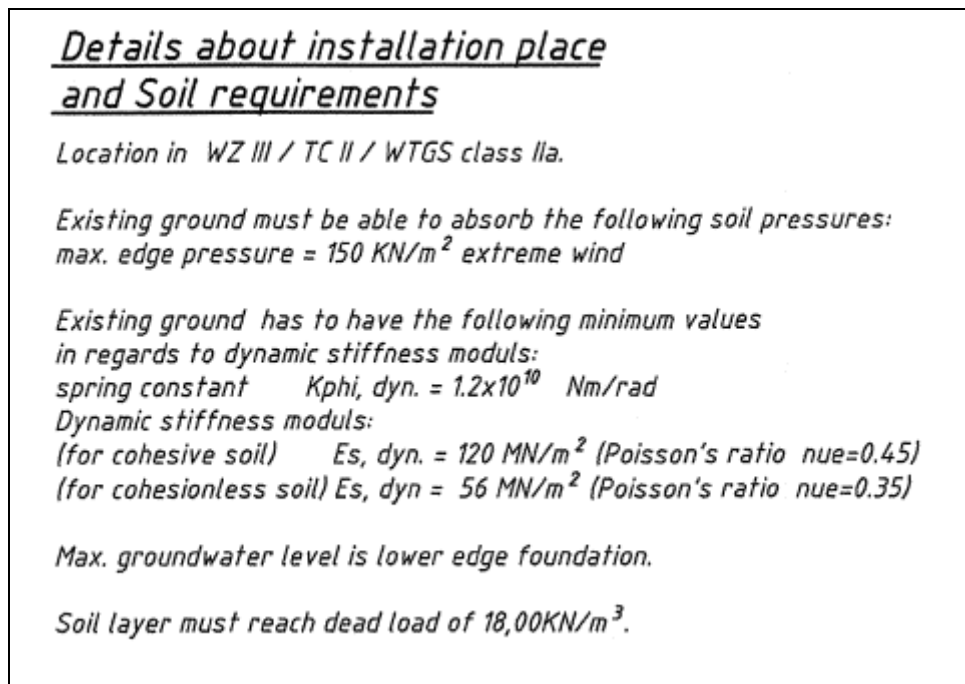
Soil requirements for a slab foundation (ENERCON, 2005)
